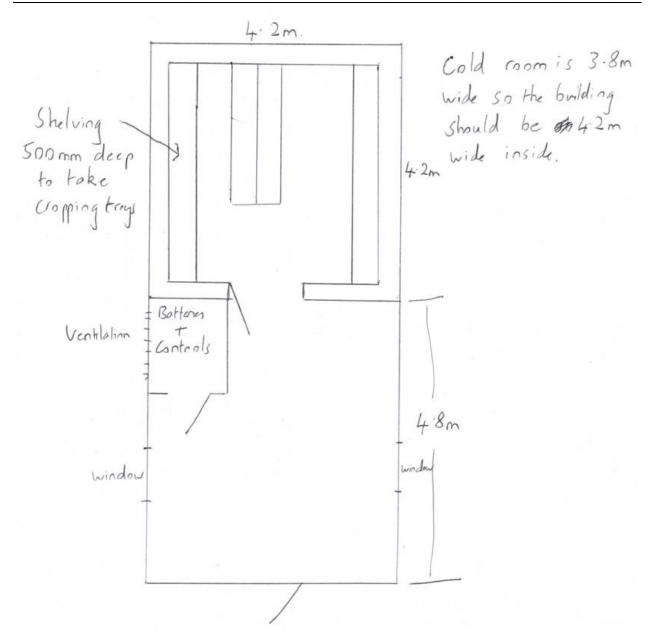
Simple drawing used to guide construction of multi-purpose in Malawi built in just a few months (in contrast to Zimbabwe where it took many months just to produce a CAD drawing)
